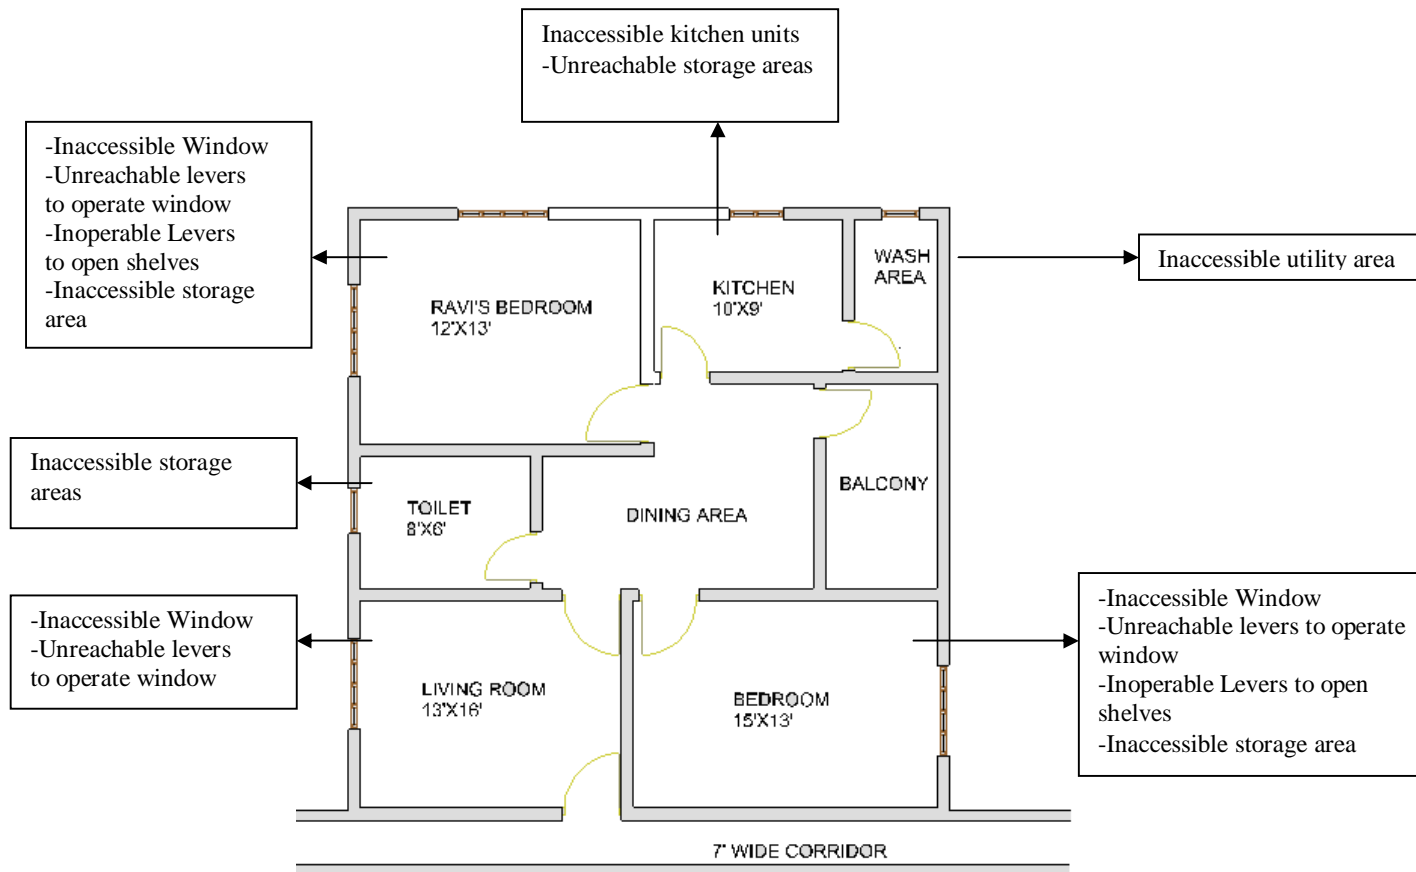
House layout of Ravi Krishnan with the problem areas and features
